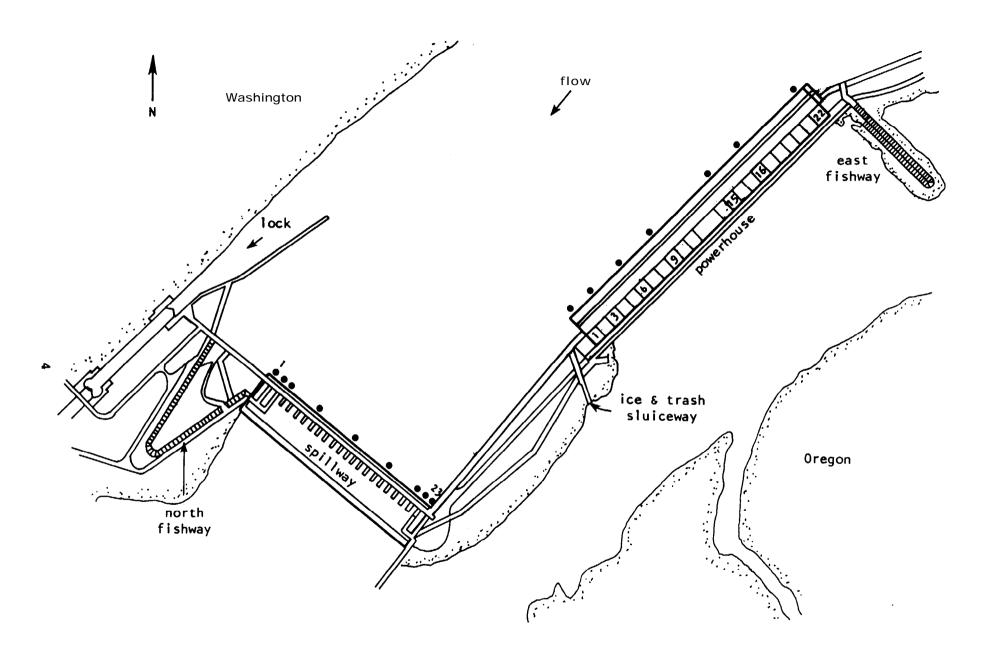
Plan view of The Dalles Dam showing transducer locations used in 1985.
